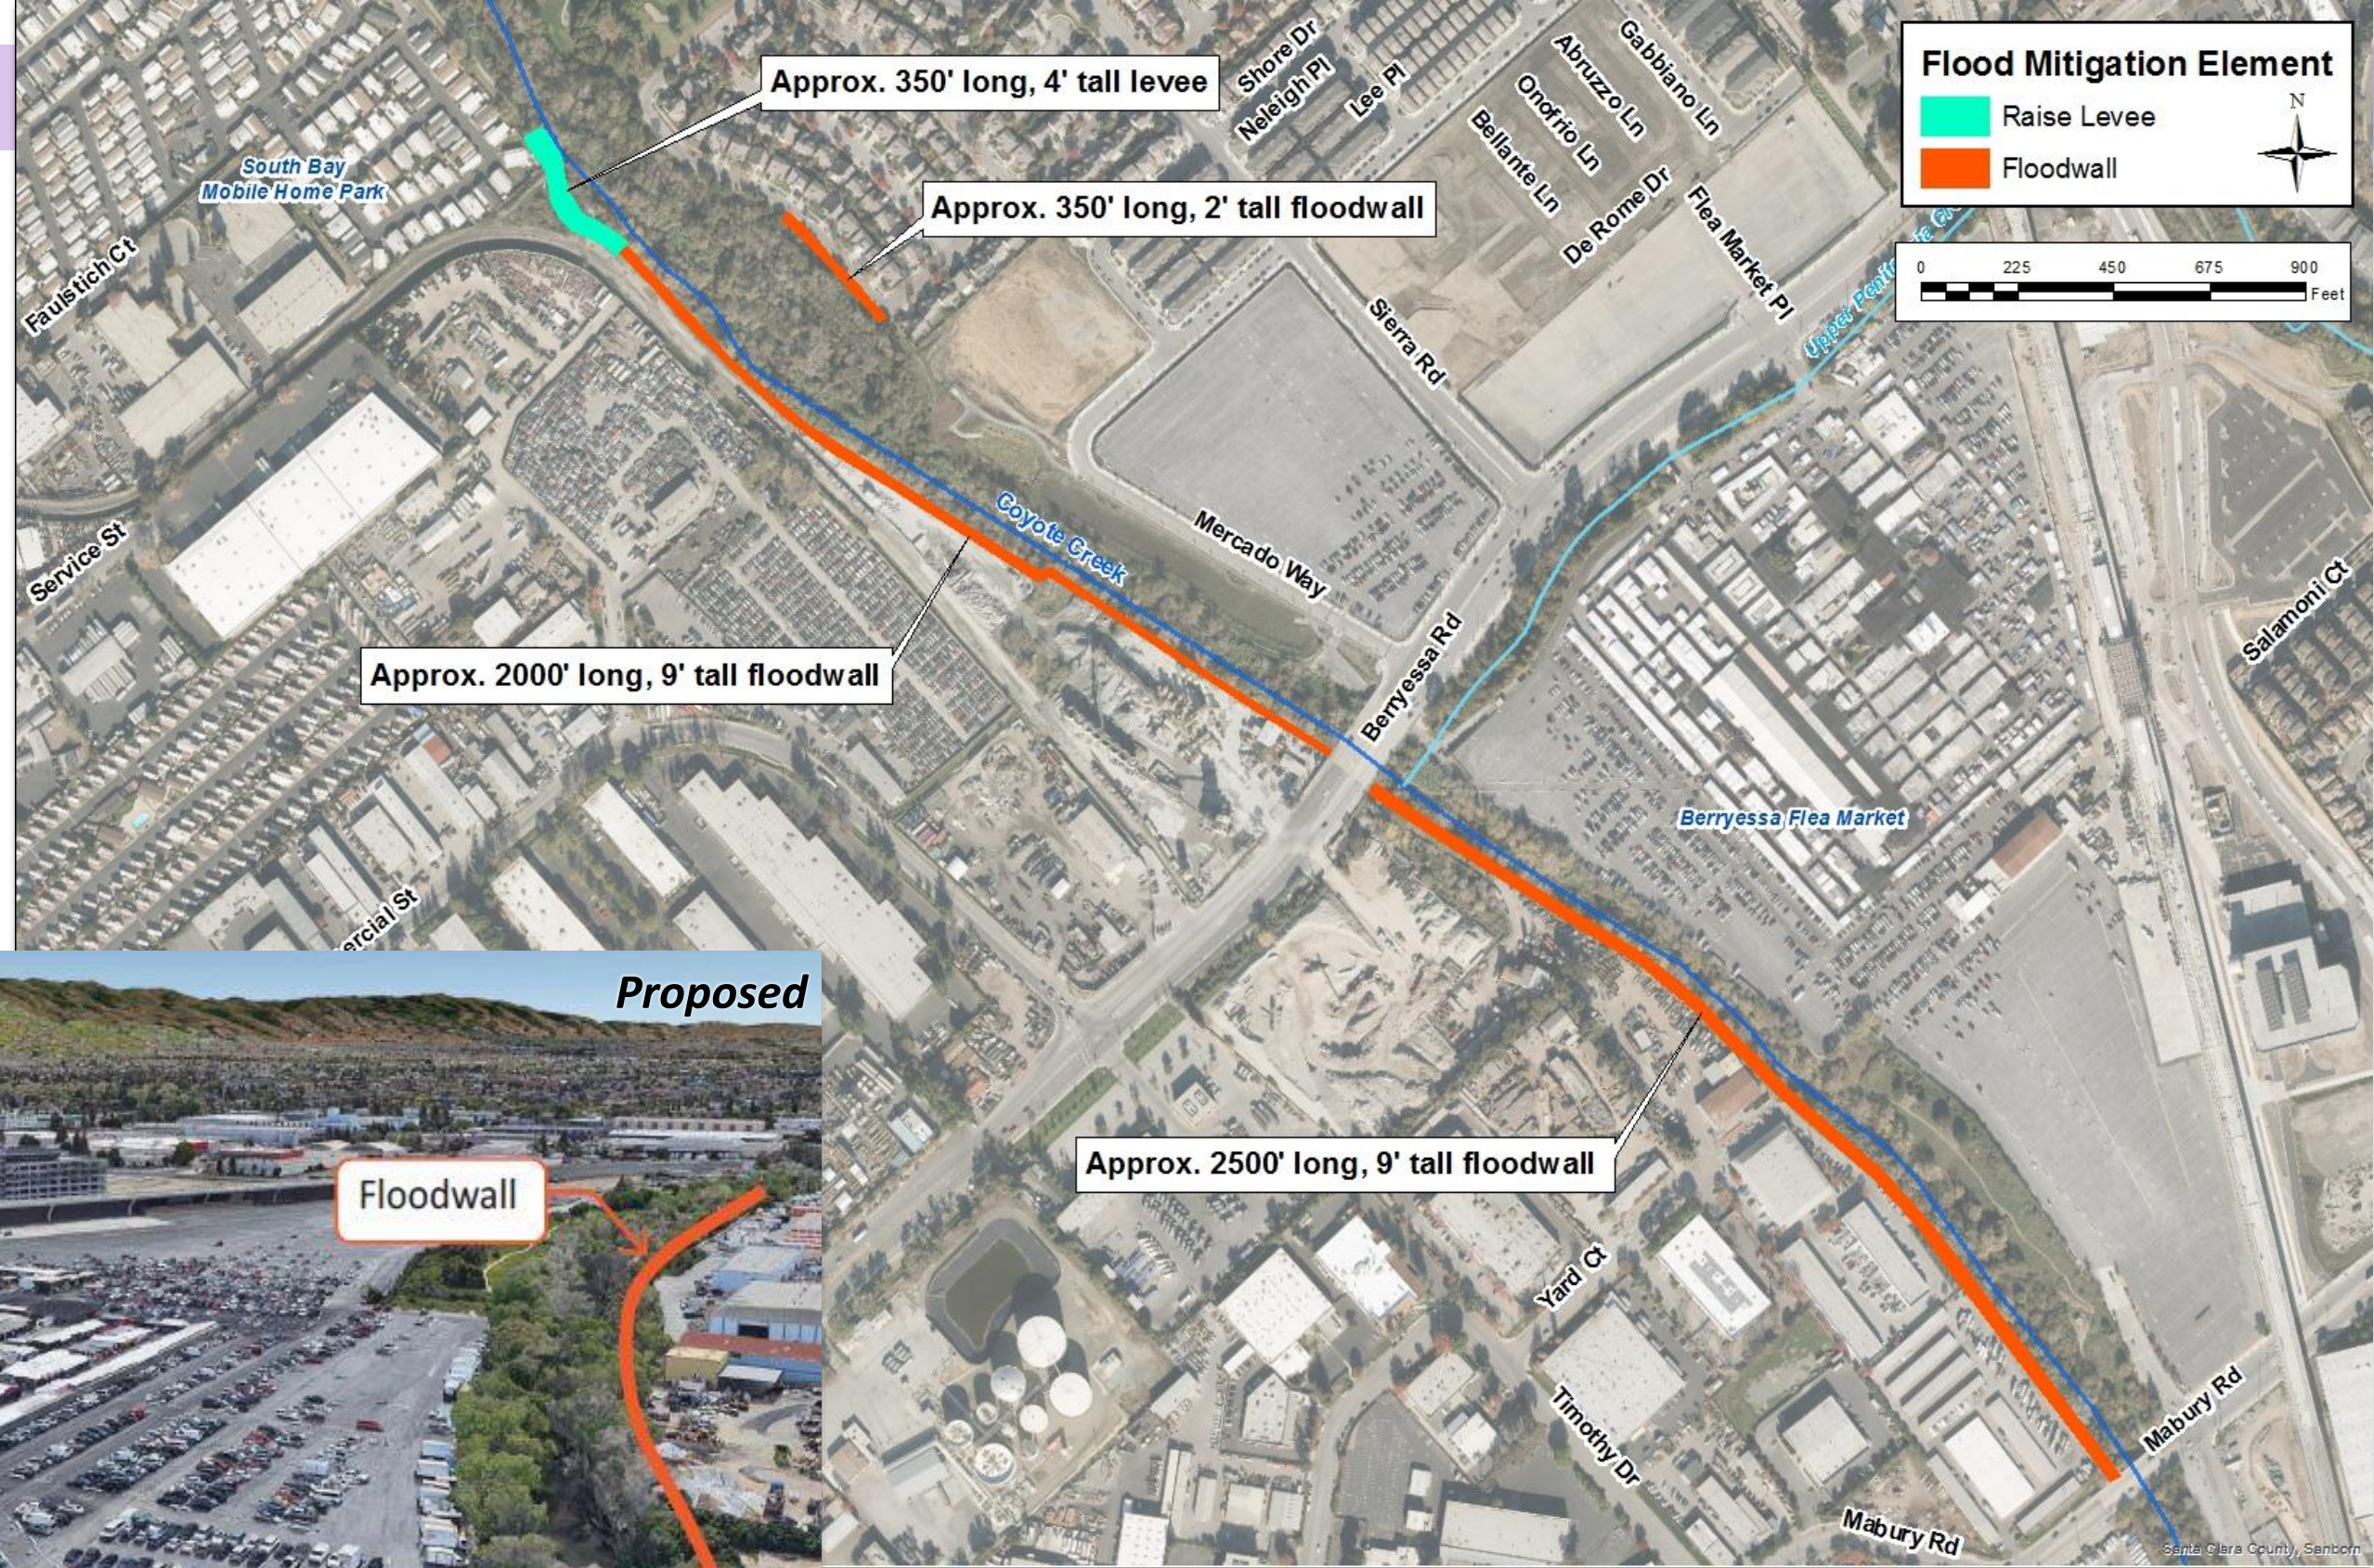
Plan View of Reach 5 – Old Oakland Road to Mabury Road – For Feasible Alternative E1, E2, E3, E5, F1, F2, F3 & F5
